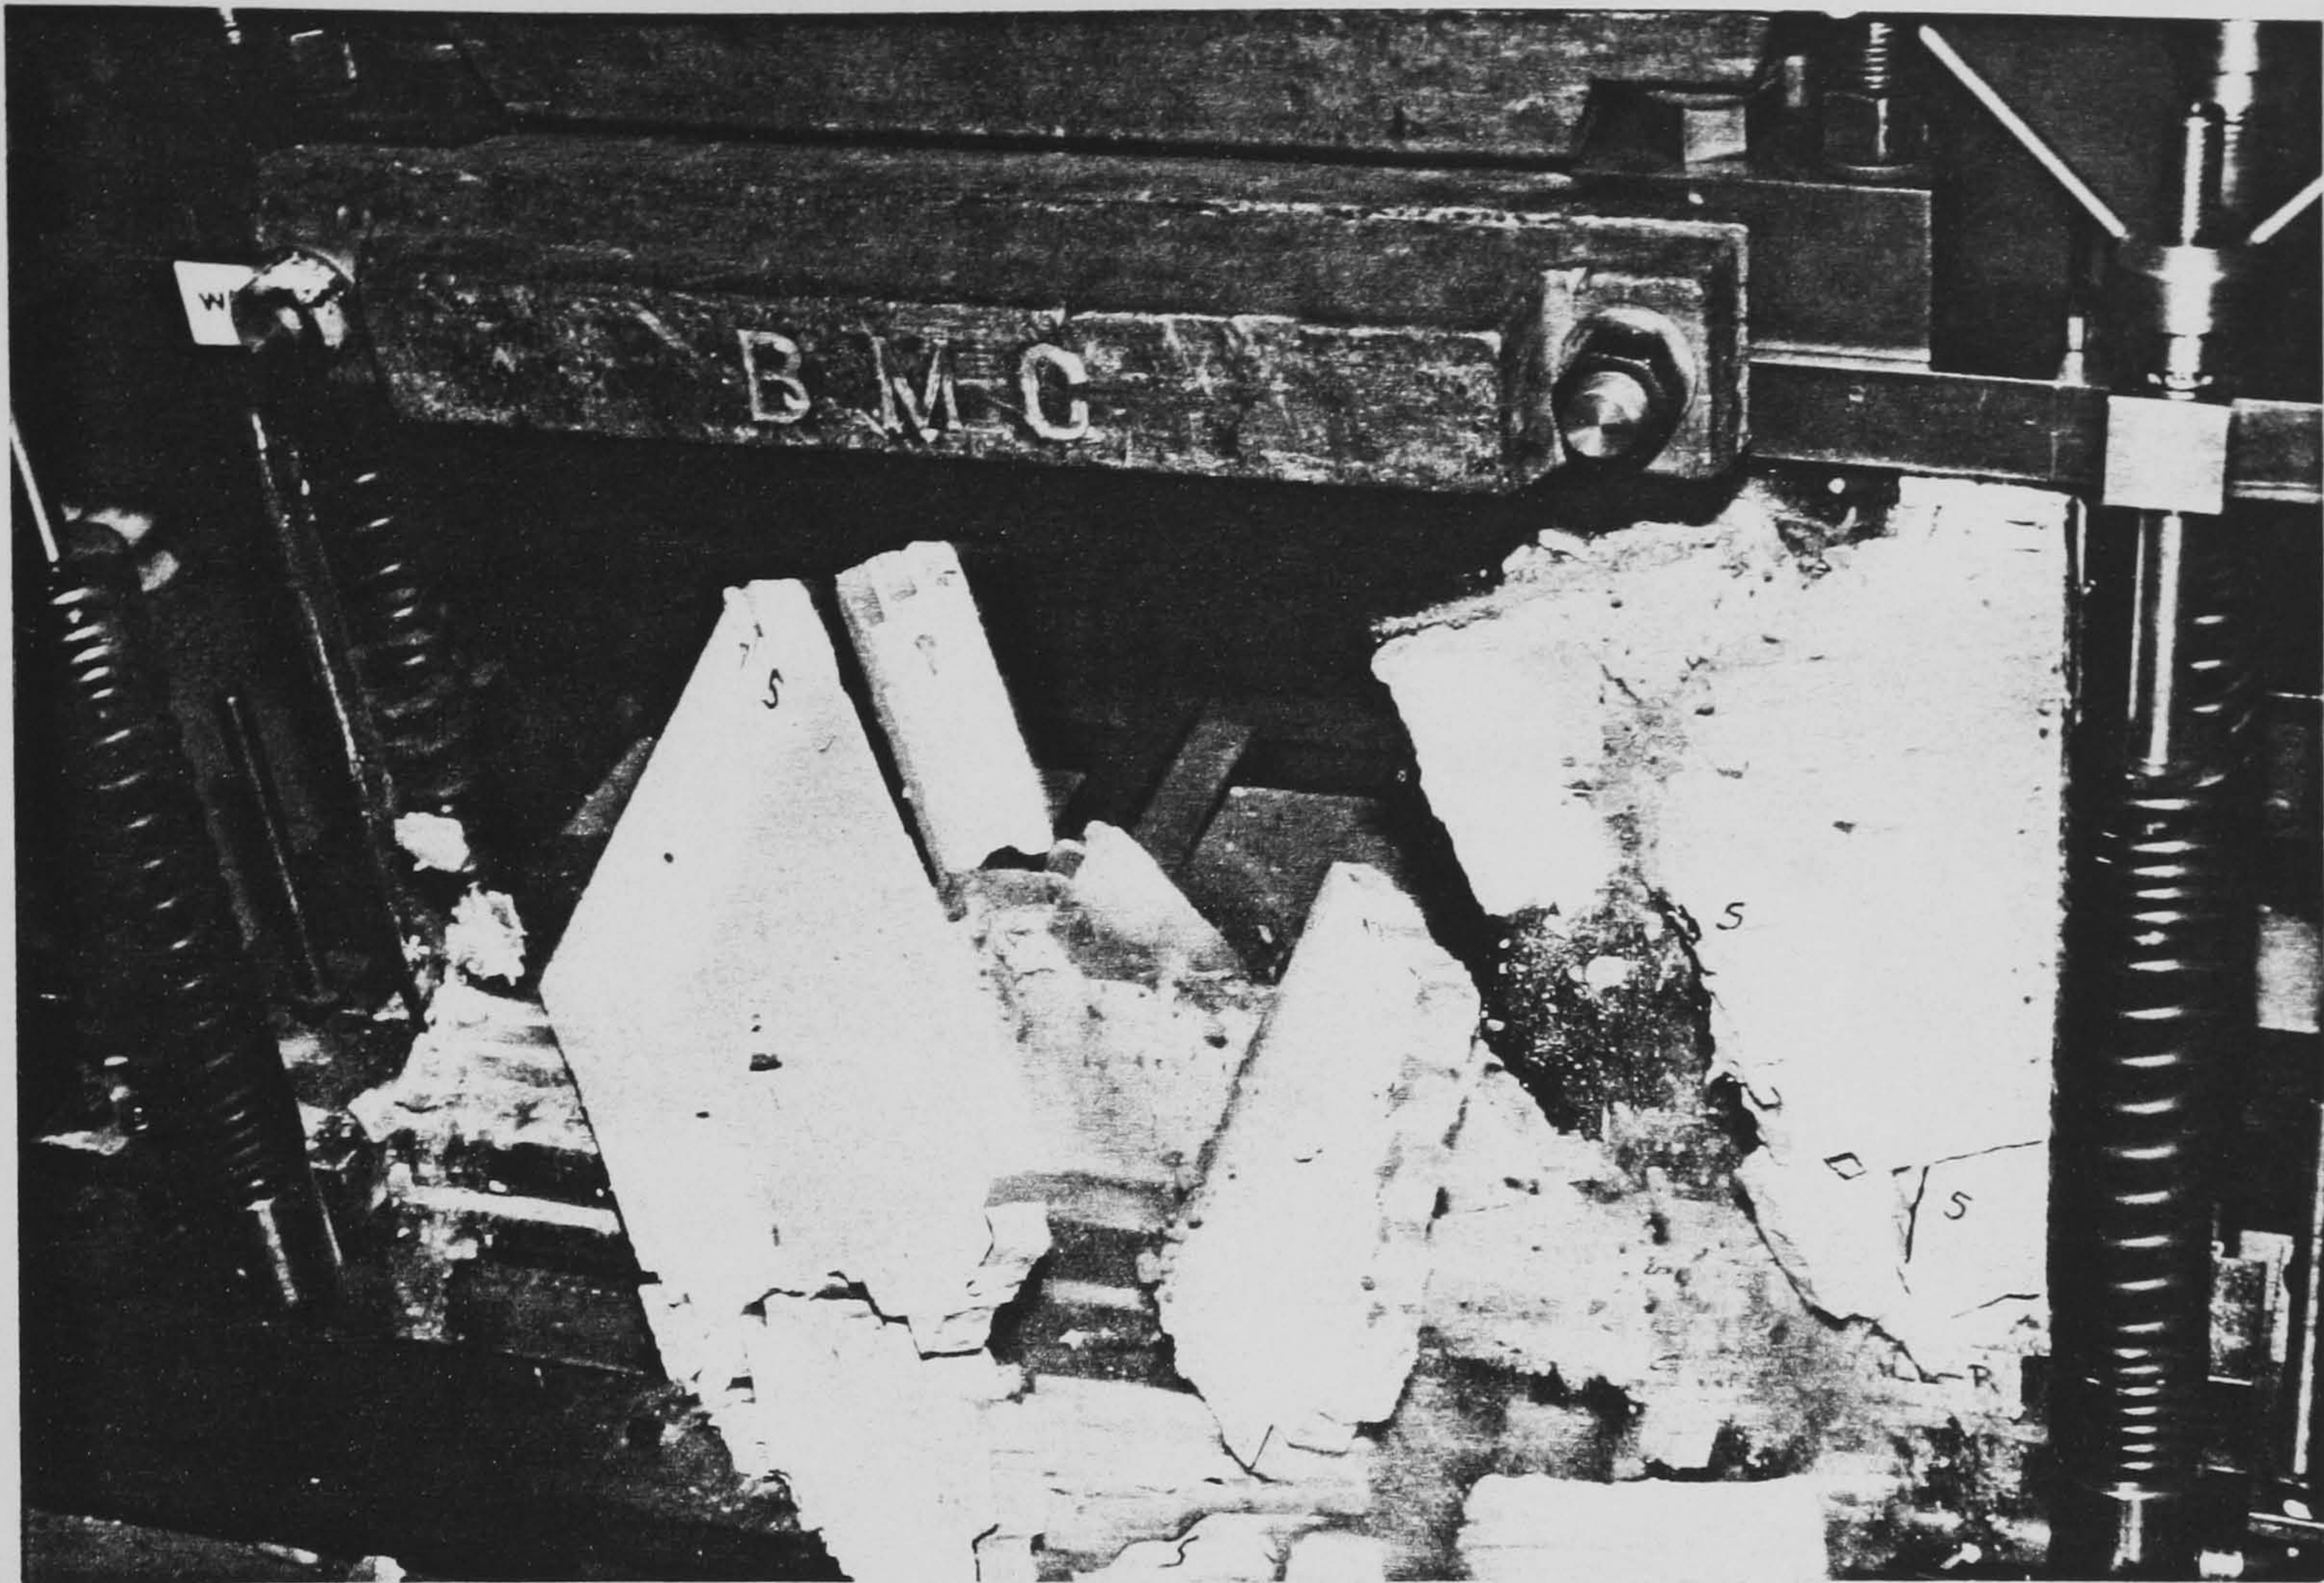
Collapse sequence and destruction-frame 3 (wall-R)
